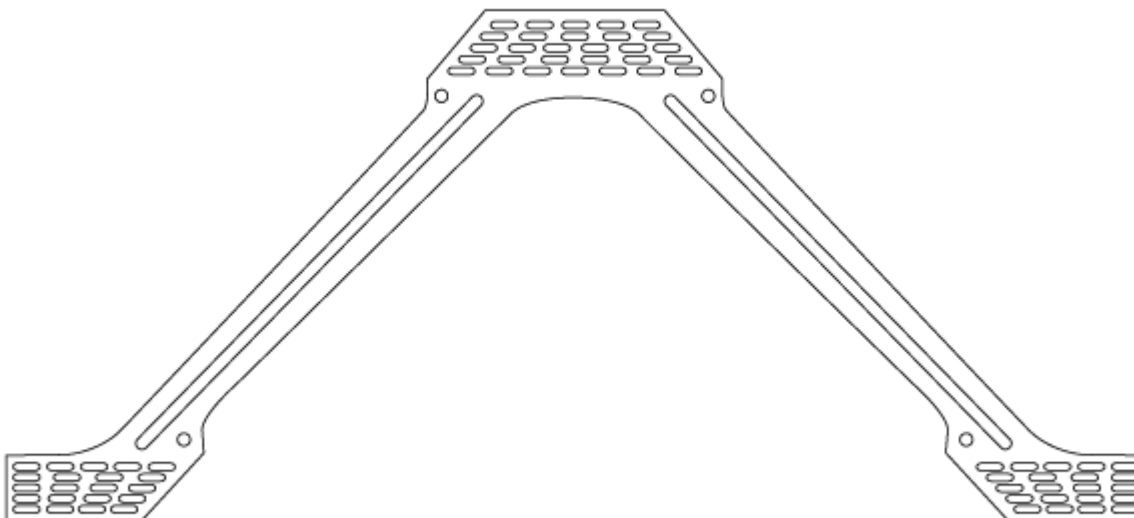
“Posi-Strut® Metal Web Joists” – galvanized steel web element
